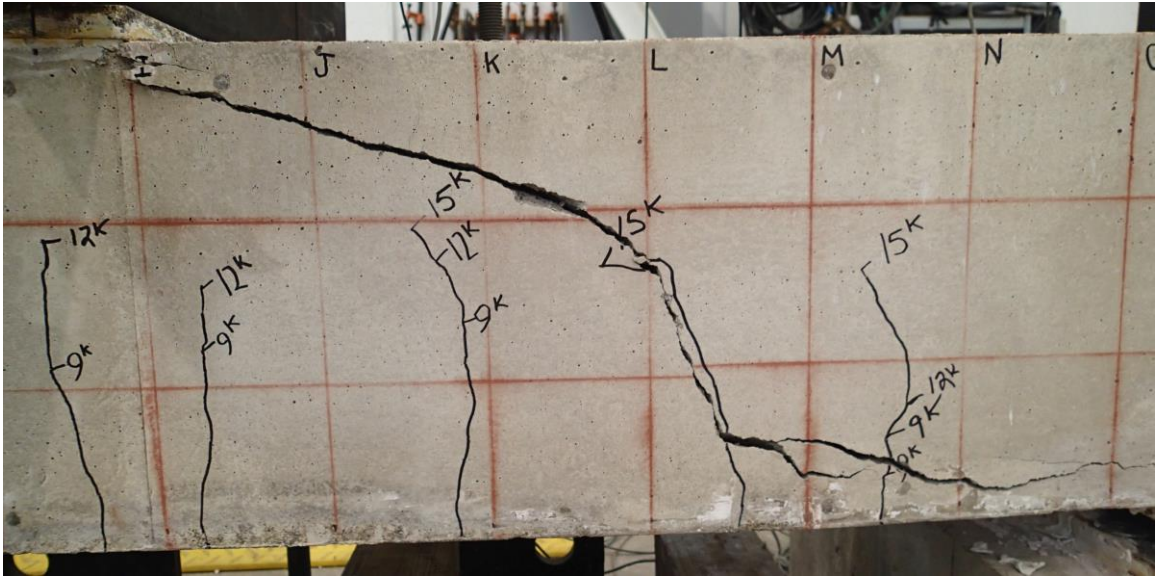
Specimen H-2: South Side Failure Inclined Crack
